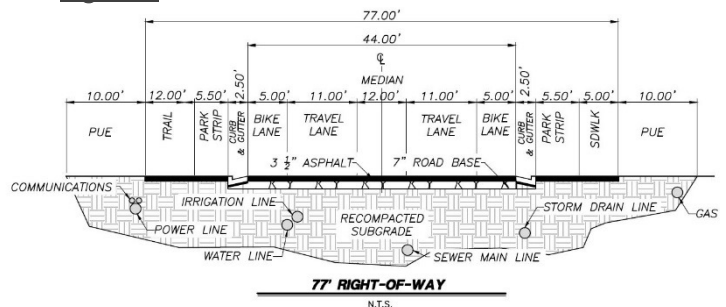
Typical section will include all public facilities to necessitate full build-out of this road
